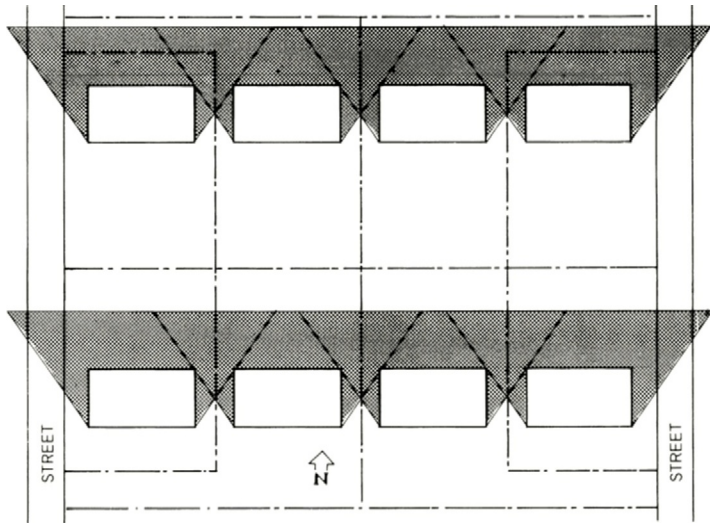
Flag lots (driveway looks like a flagpole) can achieve a good orientation for each building on a north-south street.
